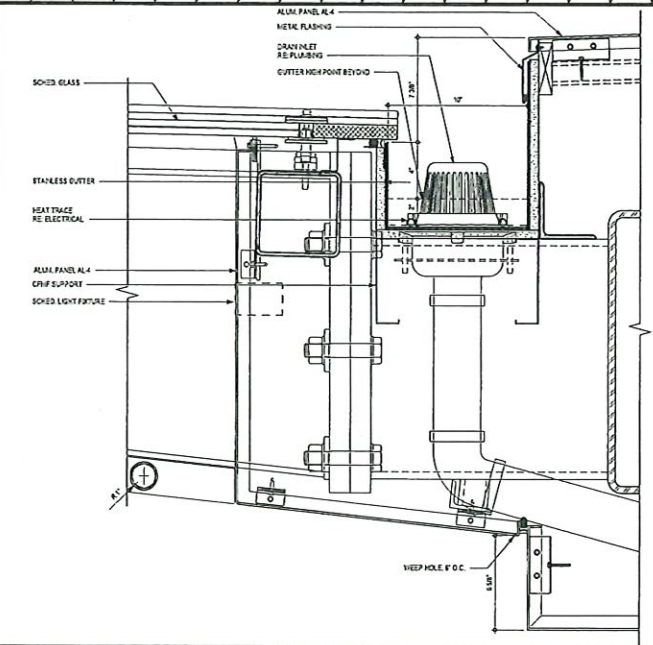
DETAIL - BIKE RACK CANOPY 3" = 1'-0" 42
